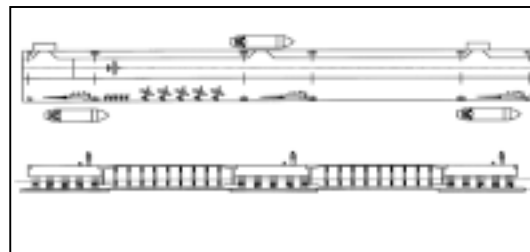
Semi-Submersible Modules with Flexible Bridges MOB (plan and elevation views, respectively)
